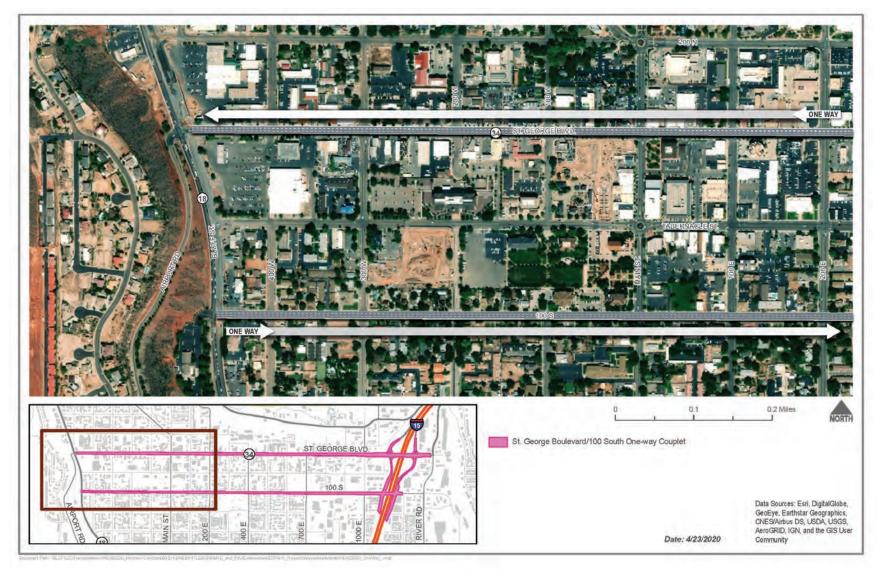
St. George Boulevard/100 South One-way Couplet Plan View (1 of 4)
